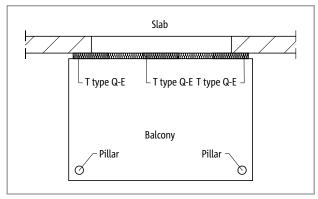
Schöck Isokorb® T type Q-E: Balcony with pillar support
